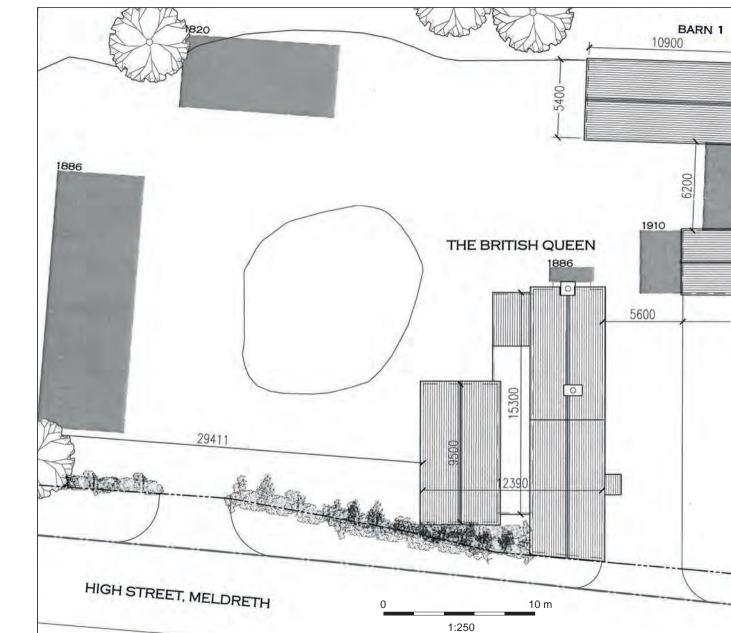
Client plan showing barn location and detailed layout of site, including former location of outbuildings (greyed out)
